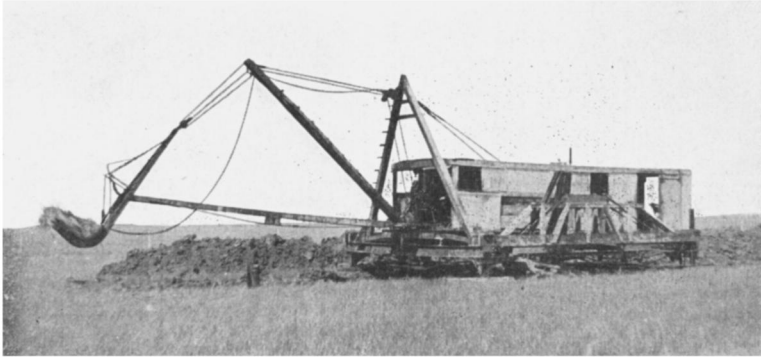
WALKING DREDGE EXCAVATING TRENCH ON A PRAIRIE SECTION
